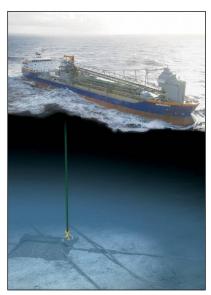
Subsea rock installation (SRI) – accurate positioning by fall pipe
